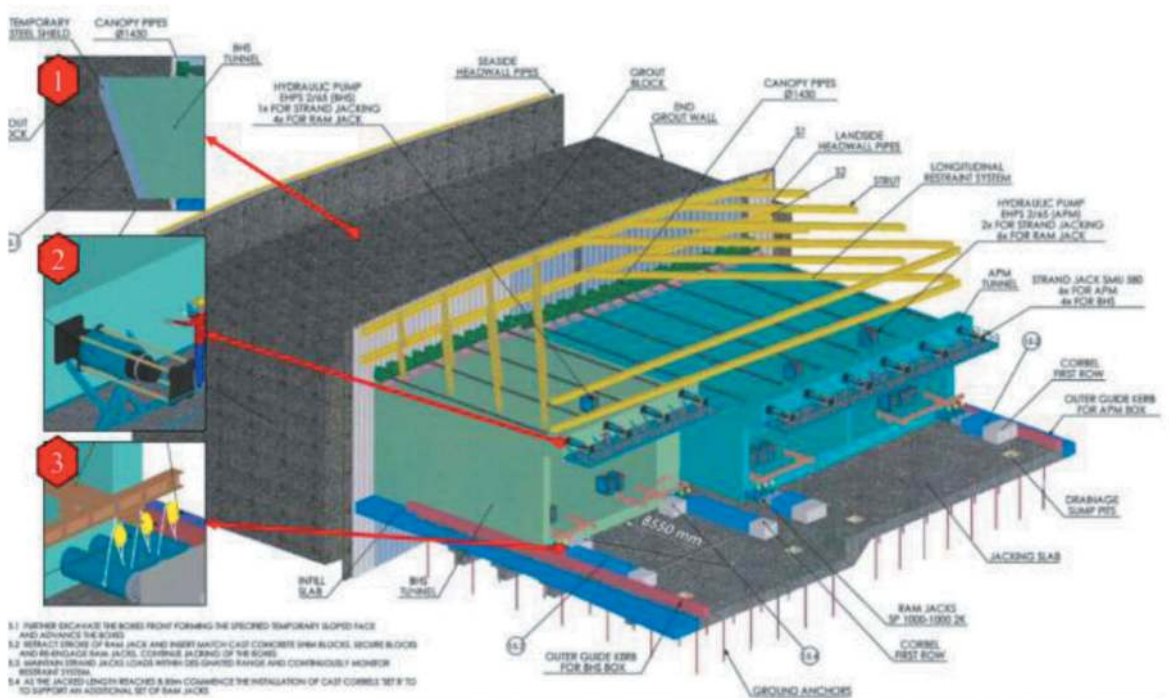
Schematic diagram of main tunnel box culvert jacking construction.
